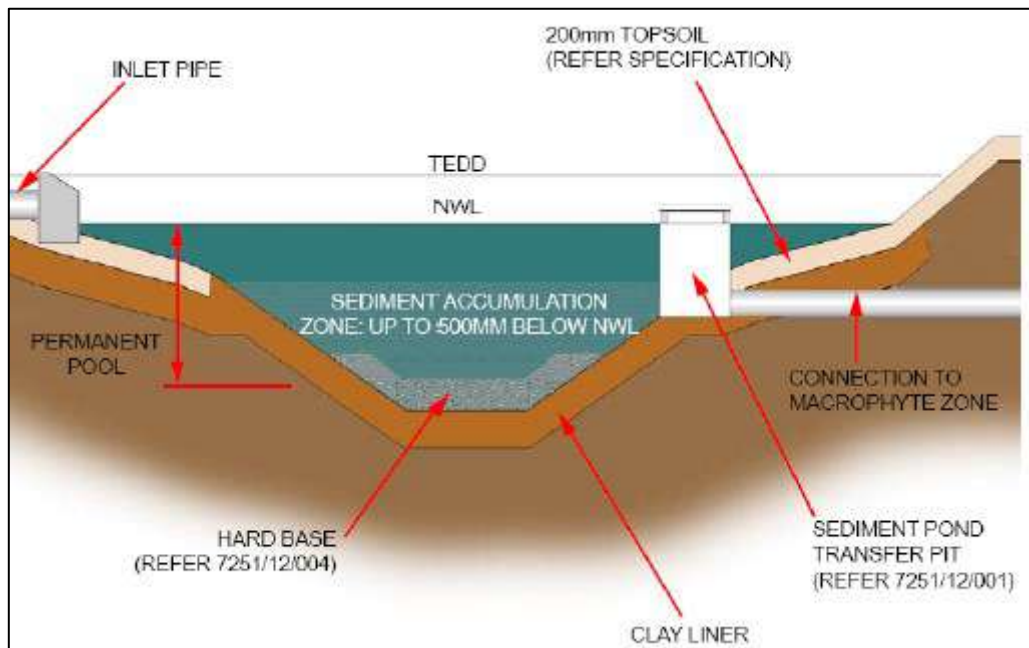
Typical Details of Sedimentation Basin (source: Melbourne Water)
